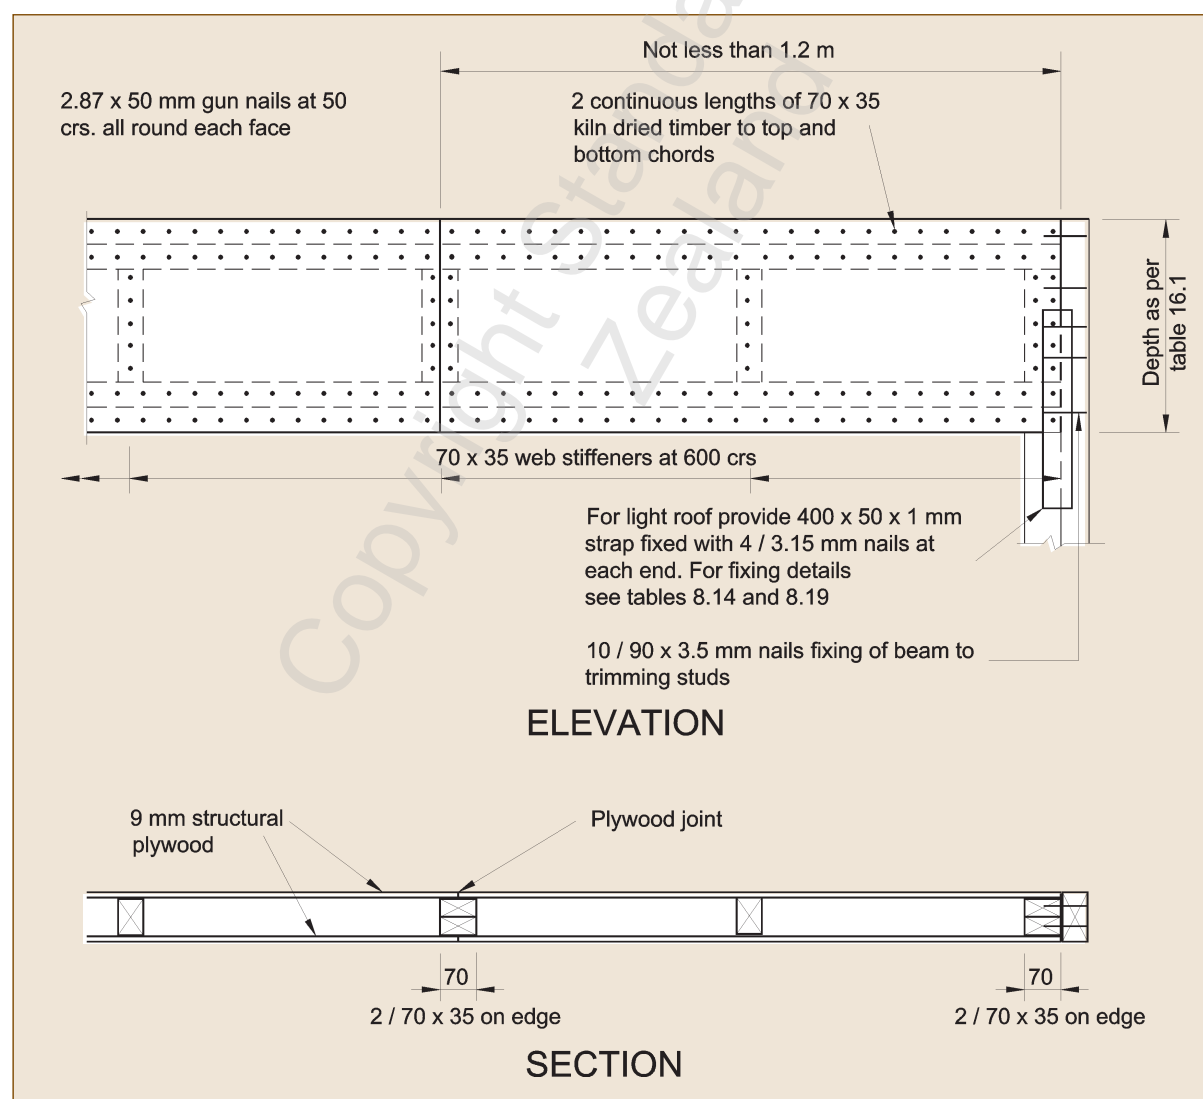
Built-up plywood box beam lintel – elevation and longitudinal section (see 8.6.1.7)
